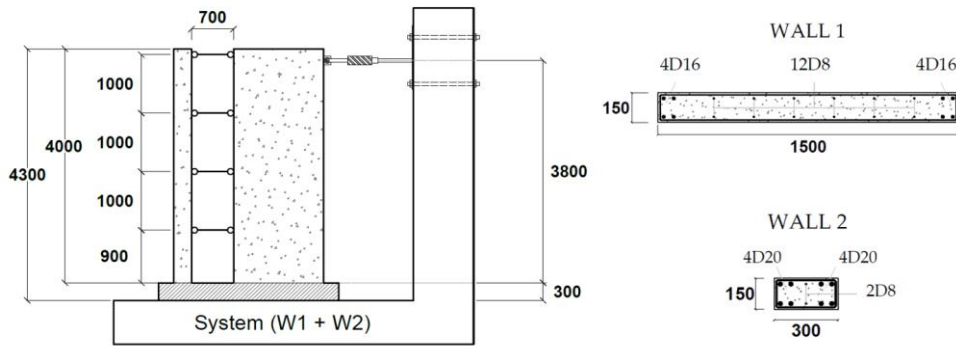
(left) Longitudinal view of the wall system with detail of pin-pin connections; (right) cross-section of the two walls (D = diameter of reinforcement bars)
